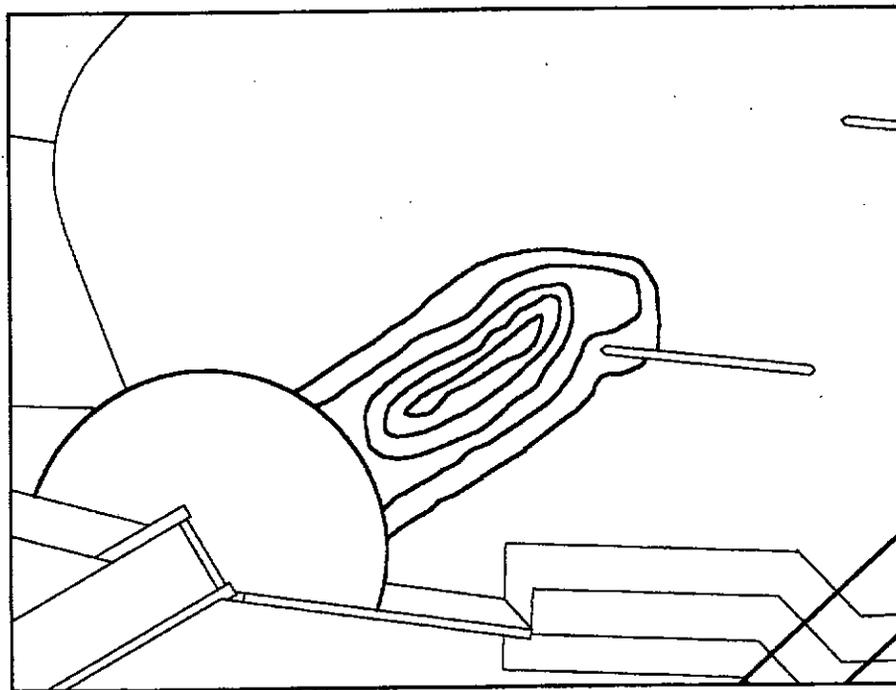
Scour pattern around the bridge pier after piers were shortened by 20 feet, 2-year flood. Two foot contours.
